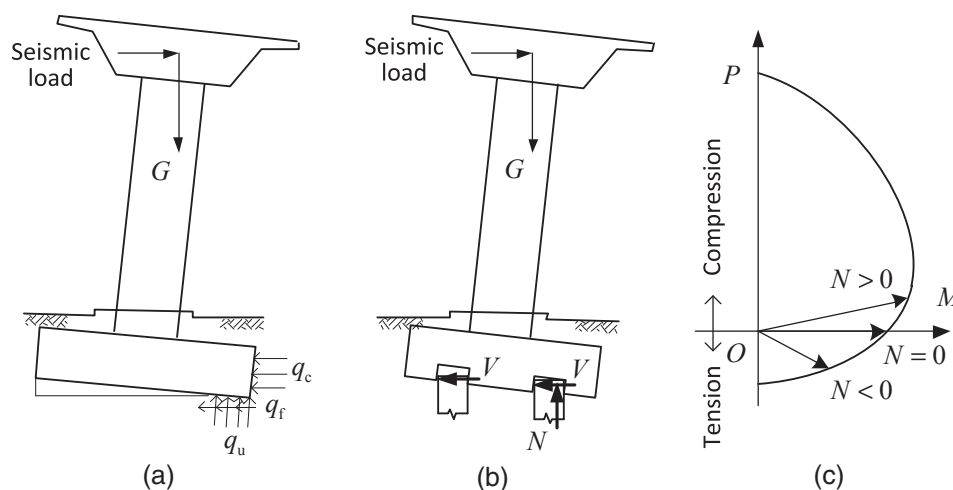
Rocking foundations: (a) Footing foundation, (b) Pile group foundation, and (c) Typical P – M interaction for reinforced concrete members.
